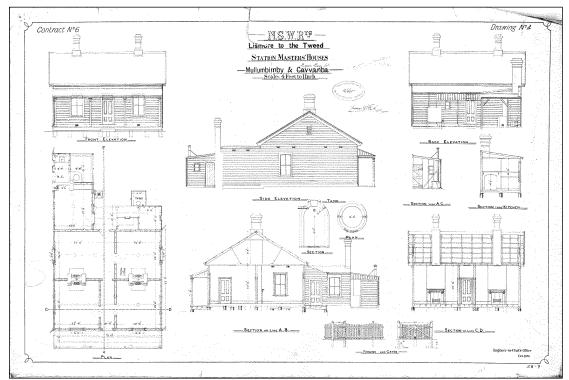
Plans of Station Master's House at Mullumbimby and Cavvanba (Byron Bay). ARHSnsw
